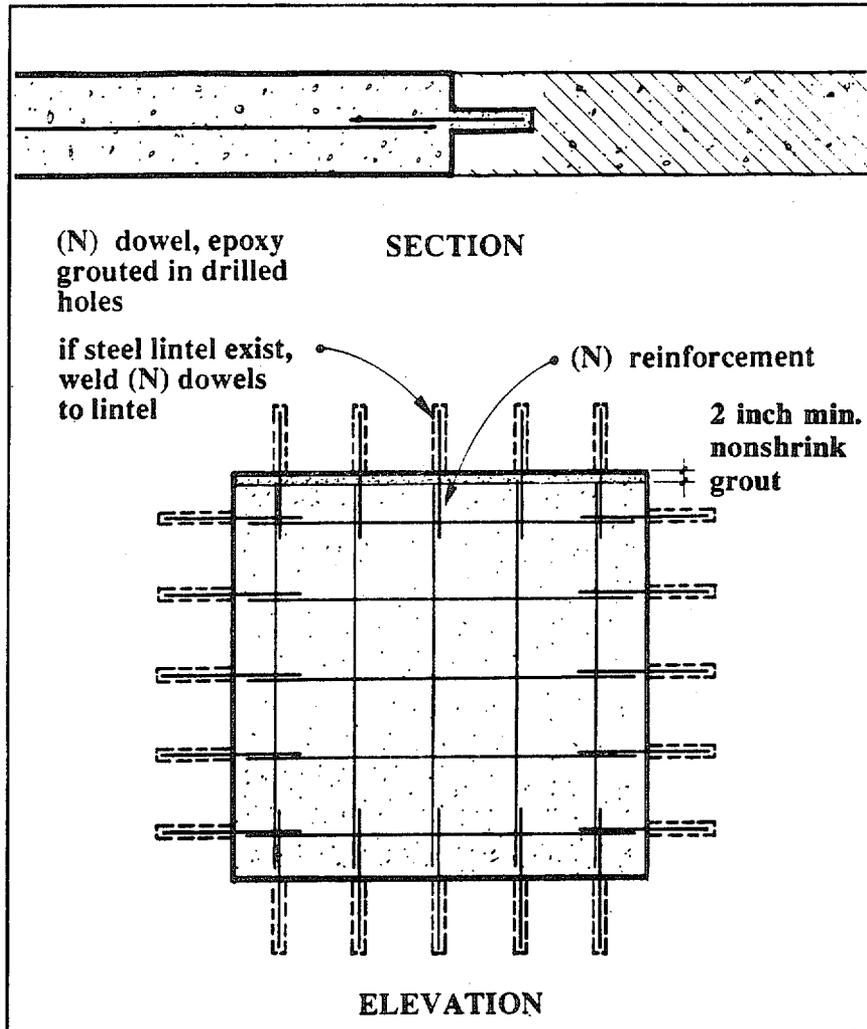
Example of details for enclosing an existing opening in a reinforced concrete or masonry wall.
